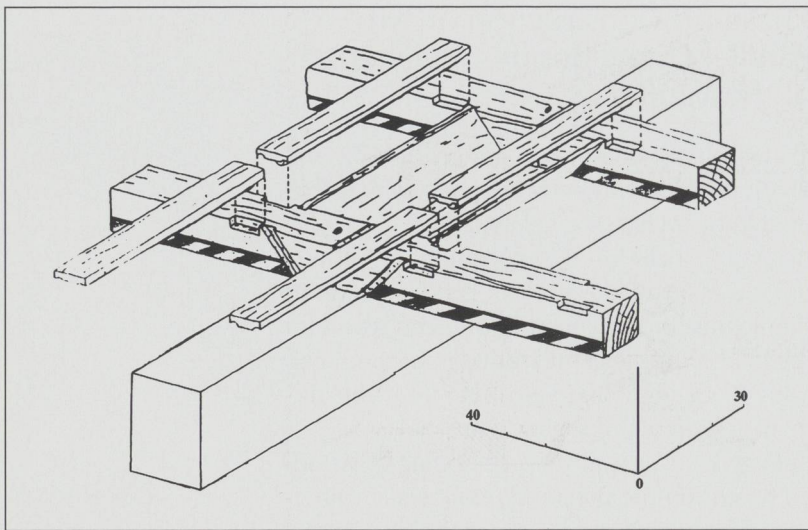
Reconstruction of a painted ceiling of the late medieval church according to wooden beams reused in the baroque building yard.
